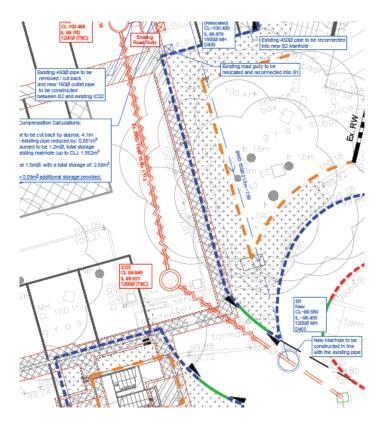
Proposed Drainage (drg. 9101) extract – Remaining Diversion Part
